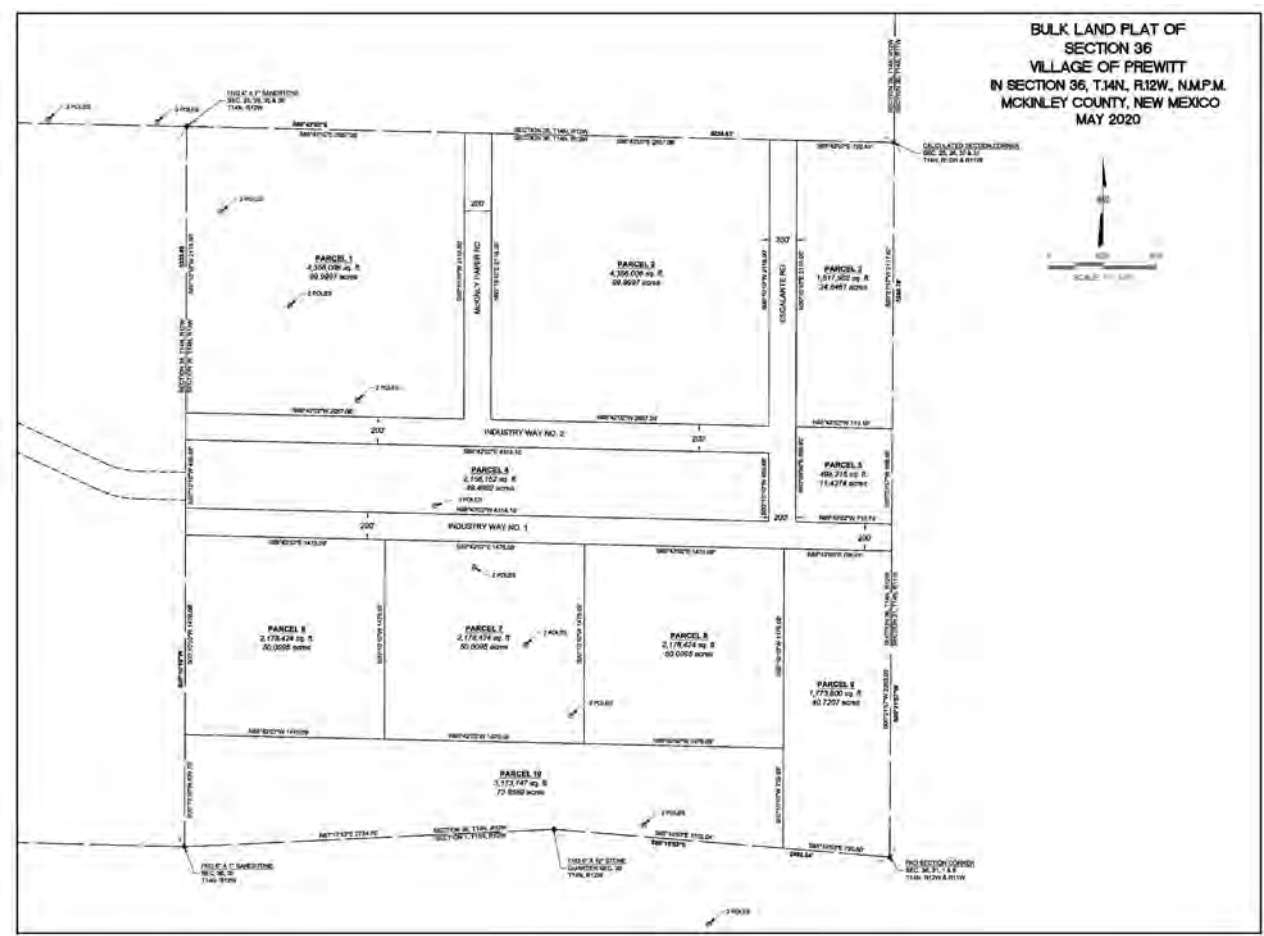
Proposed Plat for Prewitt Industrial Park Site
